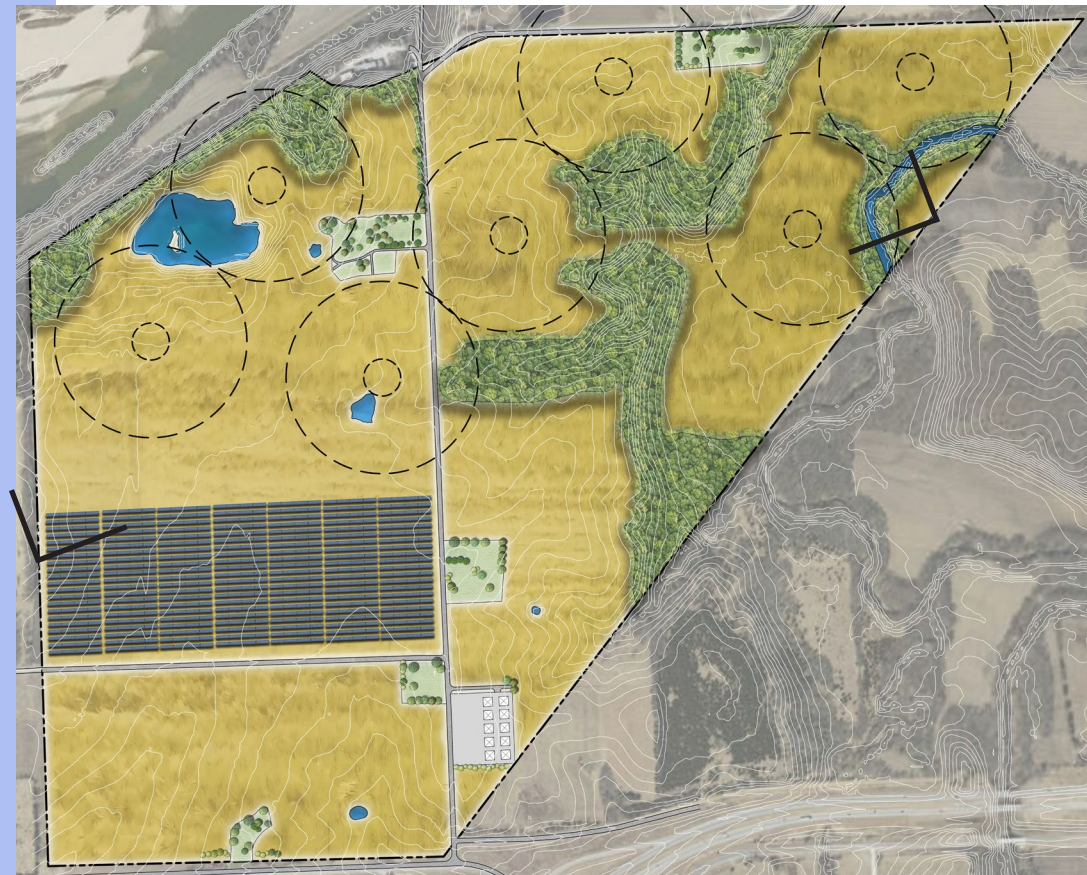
Eudora Site Plan - Eudora Site Plan (Ferrara 2020).
